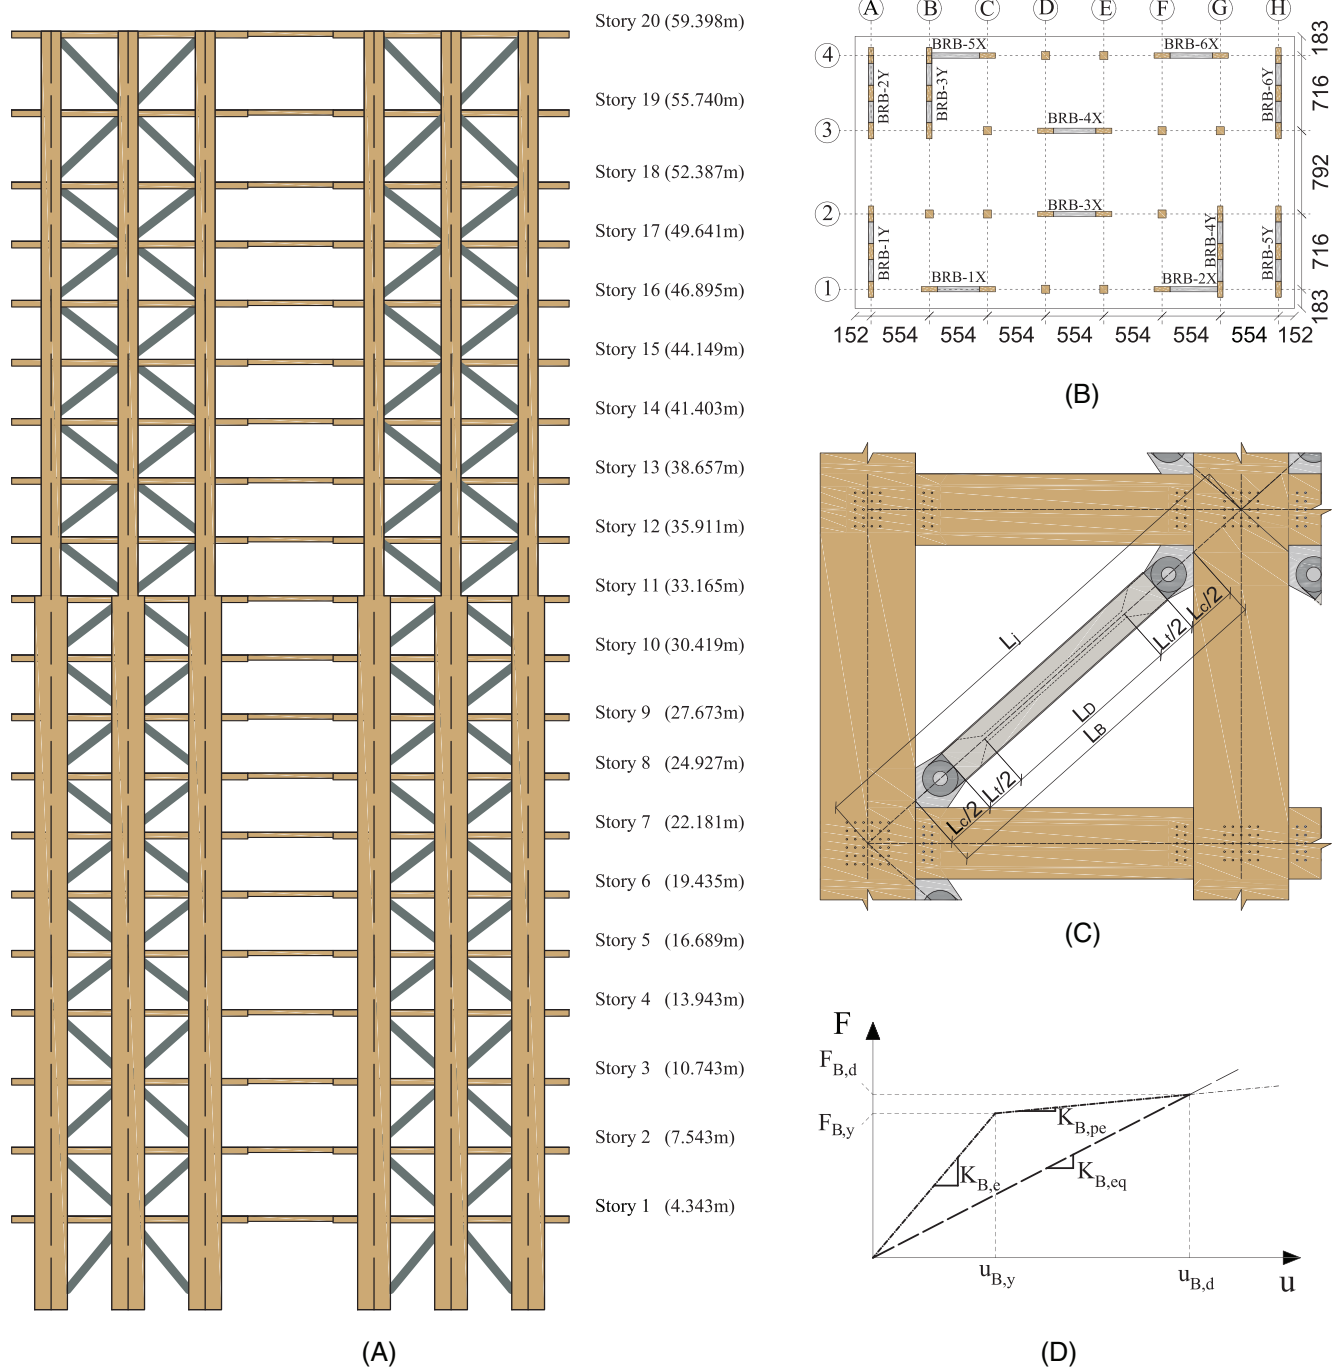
(A) Braces elevation arrangement on the case study; (B) plan view of the case study; (C) detail of BRB components arrangement; (D) Backbone curve adopted for BRB modeling. BRB, Buckling Restrained Brace.
